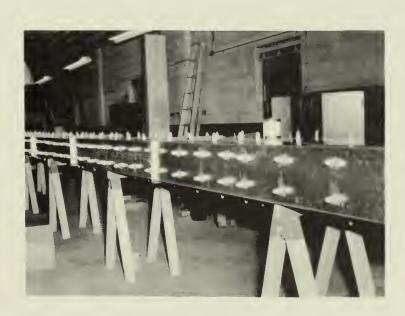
" X 24" Ducting with Clips for Mounting P.F. Board
